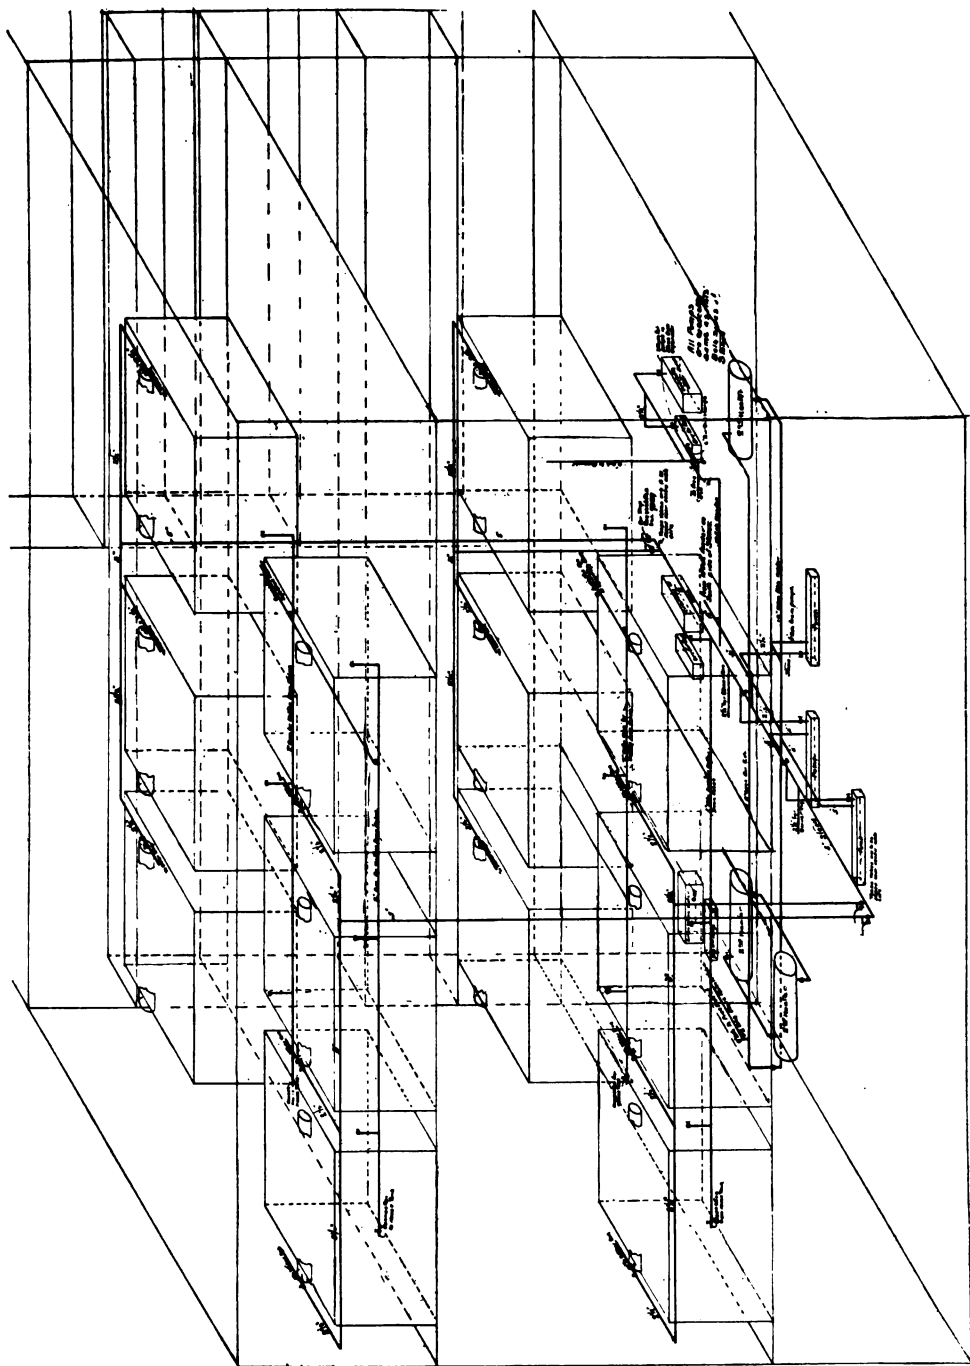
Steam and Exhaust Piping to Pumps and Heaters, Central Power Station, B. R. T.
